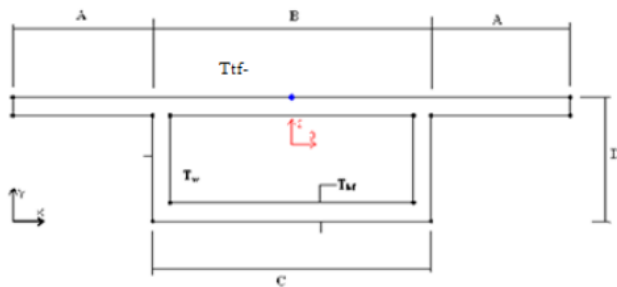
Single-cell Rectangular cross-section of Box Girder Bridge
